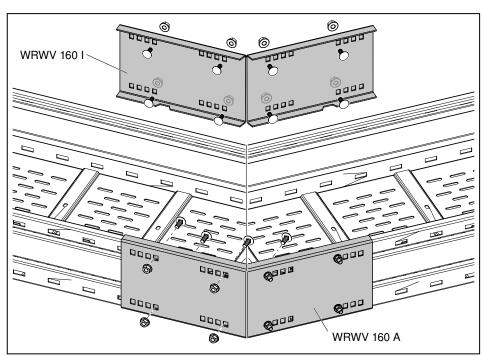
Screwing on the WRWV angle connector to the inner and outer angle
